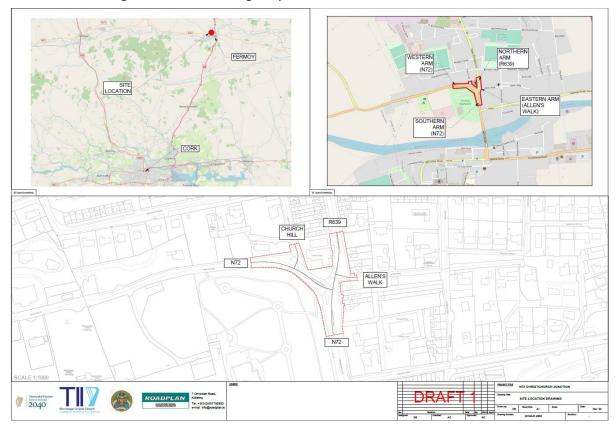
Composite plan showing location of proposed N72 Christ Church Junction works.
